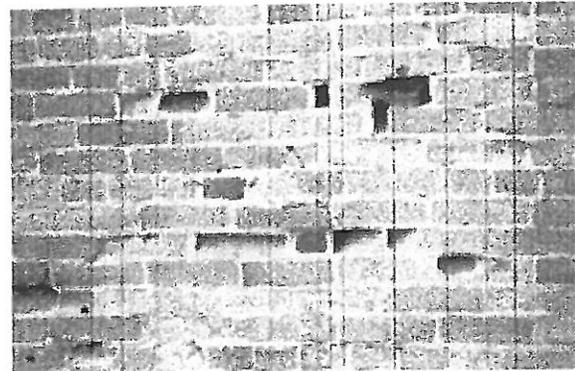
When abrasive cleaning is undertaken, including treatments such as sandblasting or high-pressure water washing, spalling can occur to the soft brick surfaces of historic brick such as that found throughout downtown Peekskill.
